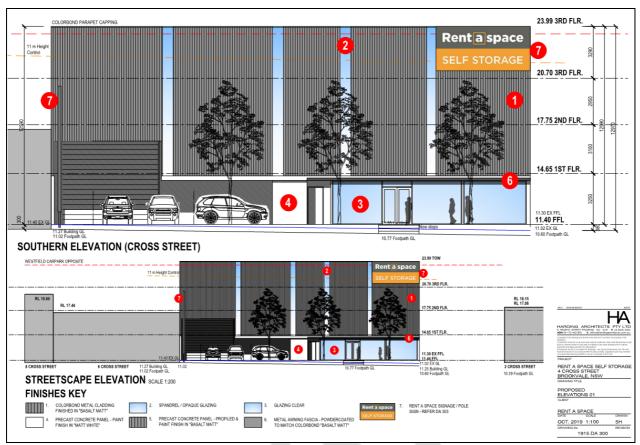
Southern Elevation (Source: Harding Architects, 2020)
